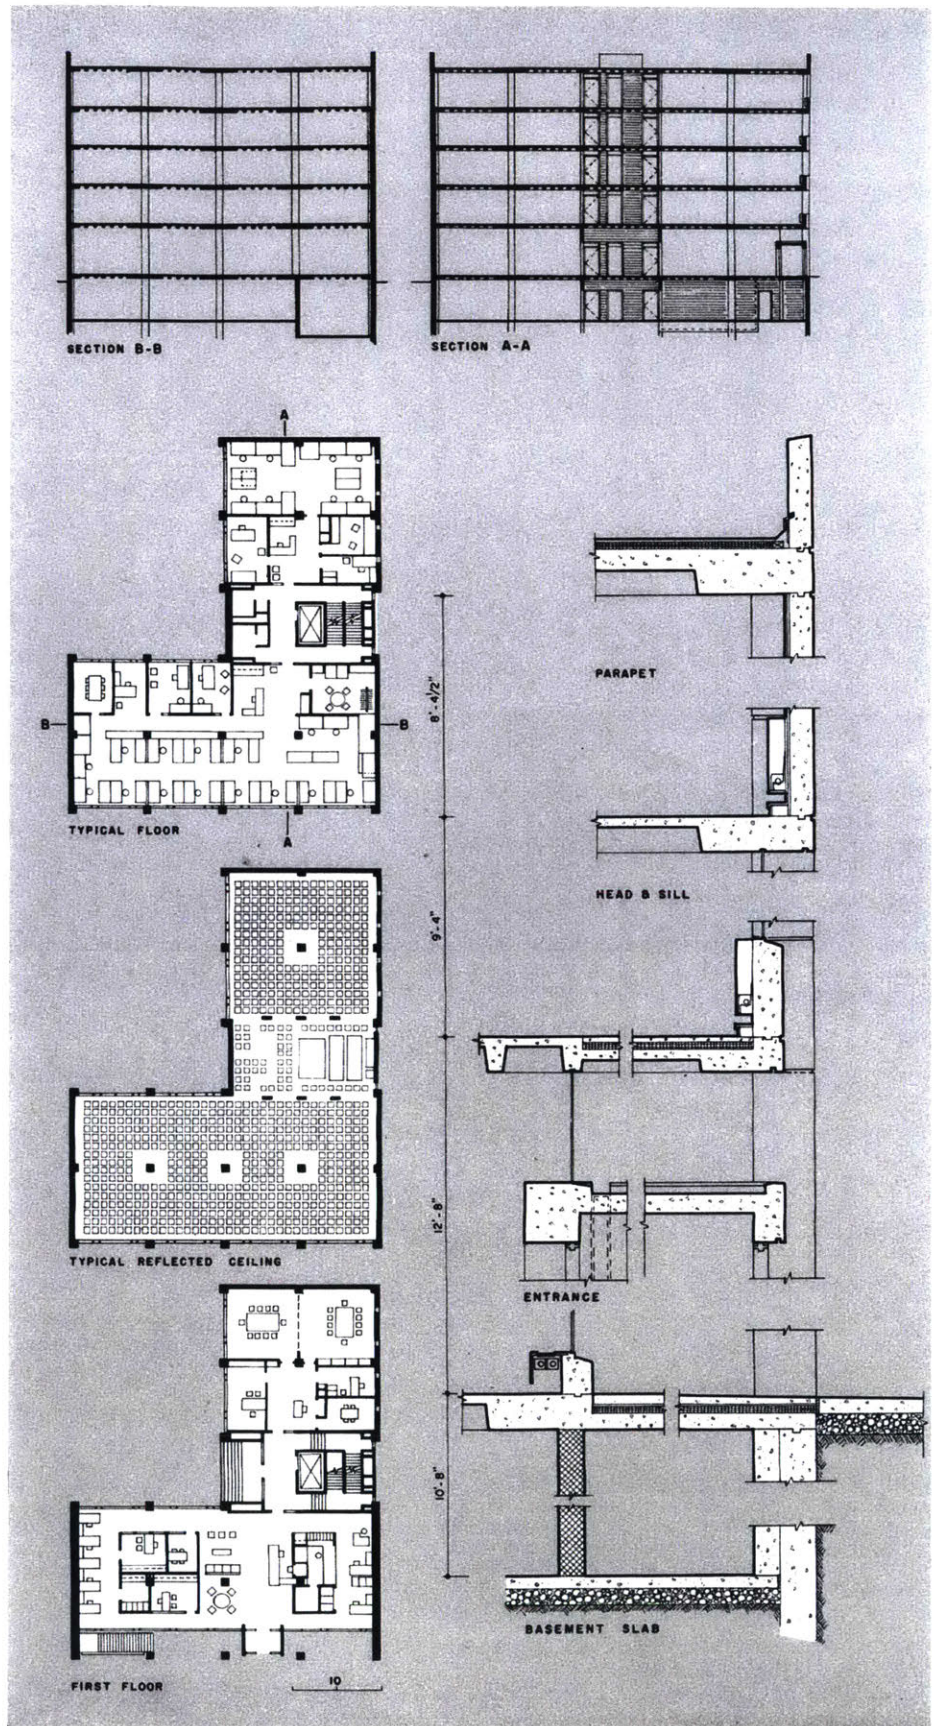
TAC offices, first floor and typical floor plans, typical reflected ceiling plan, sections and concrete joint details, *Architectural Record*, September 1967.
